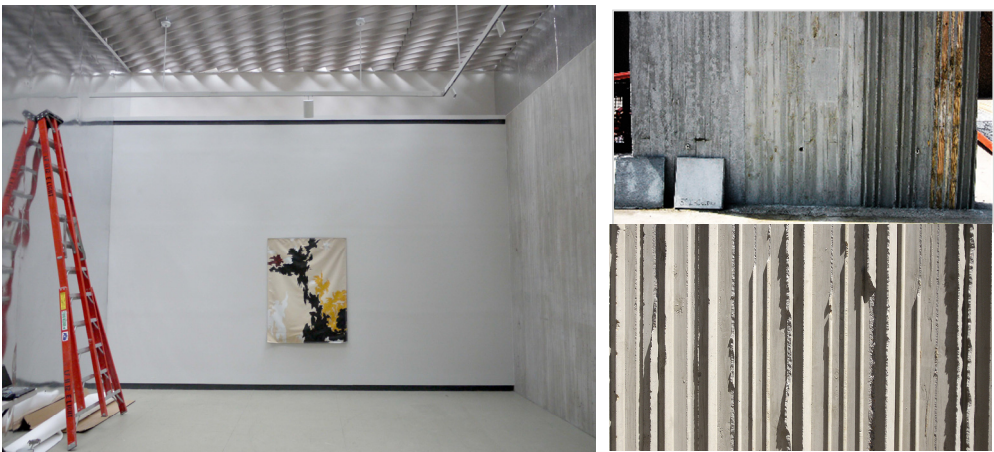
Examples of full-scale mock-ups: gallery (left) and wall detail tests (right). Source: (Arup 2015)
